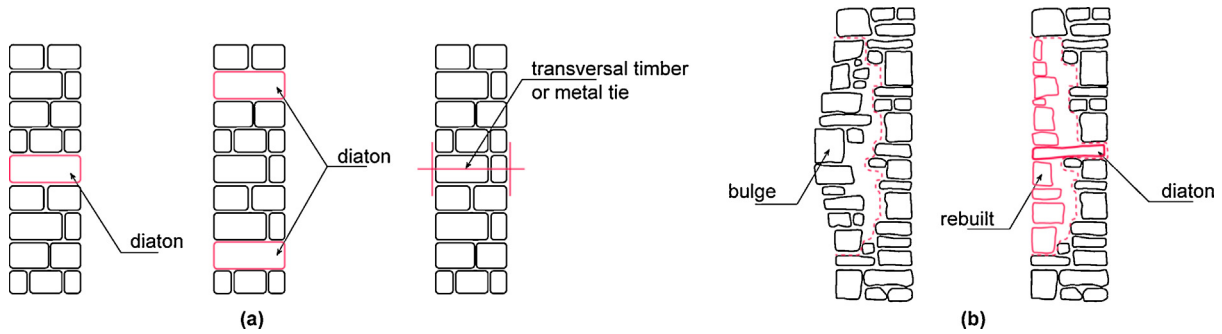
(a) Use of through-stones or “diatons” and transversal elements; and (b) partial reconstruction of masonry wall using through-stones (adapted from [24]).
